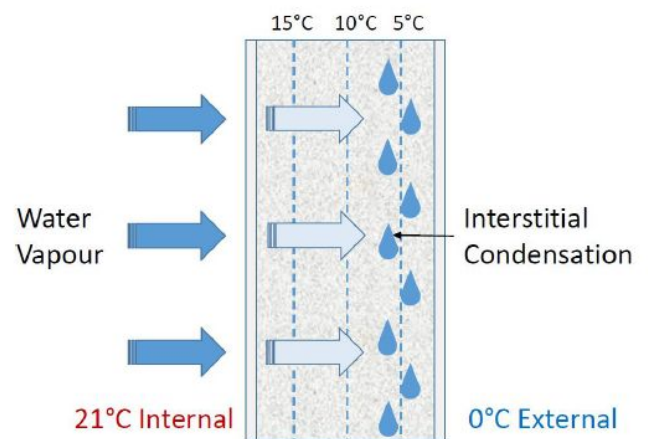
Section through an external wall illustrating the Dew Point. The drops show where the mould might grow within your wall.
